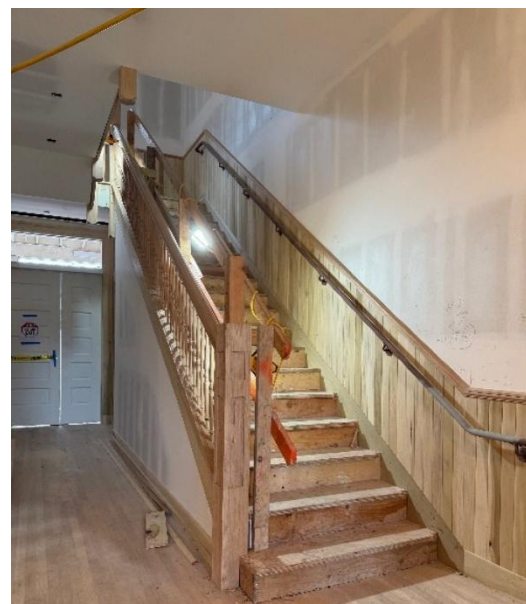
BUILDING 102 CENTRAL STAIR RECONSTRUCTION UNDERWAY
